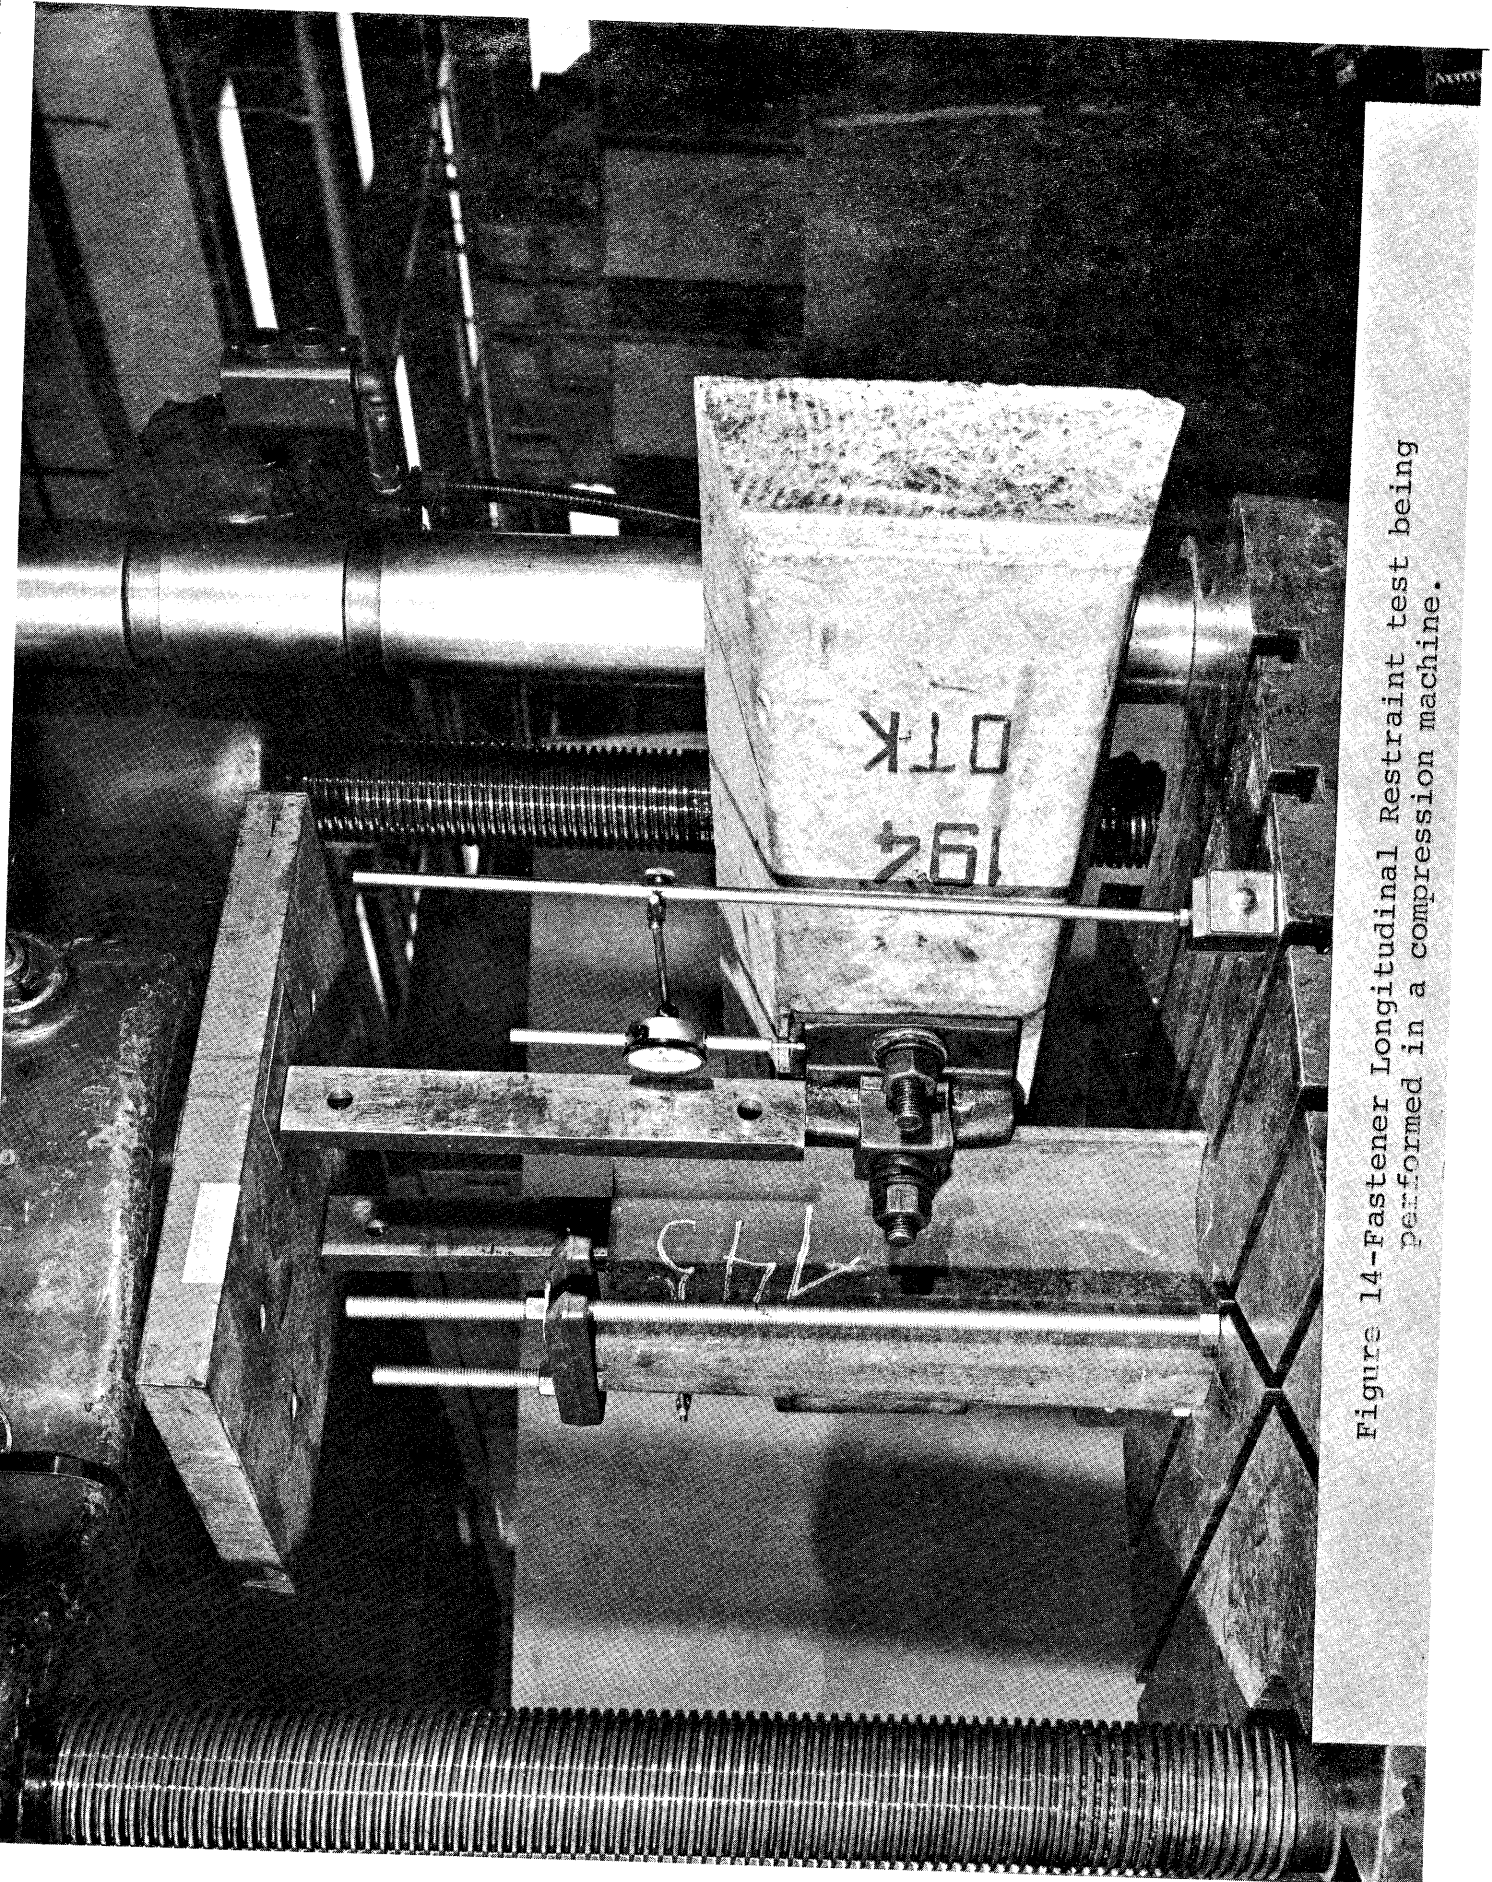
Fastener Longitudinal Restraint test being performed in a compression machine.
